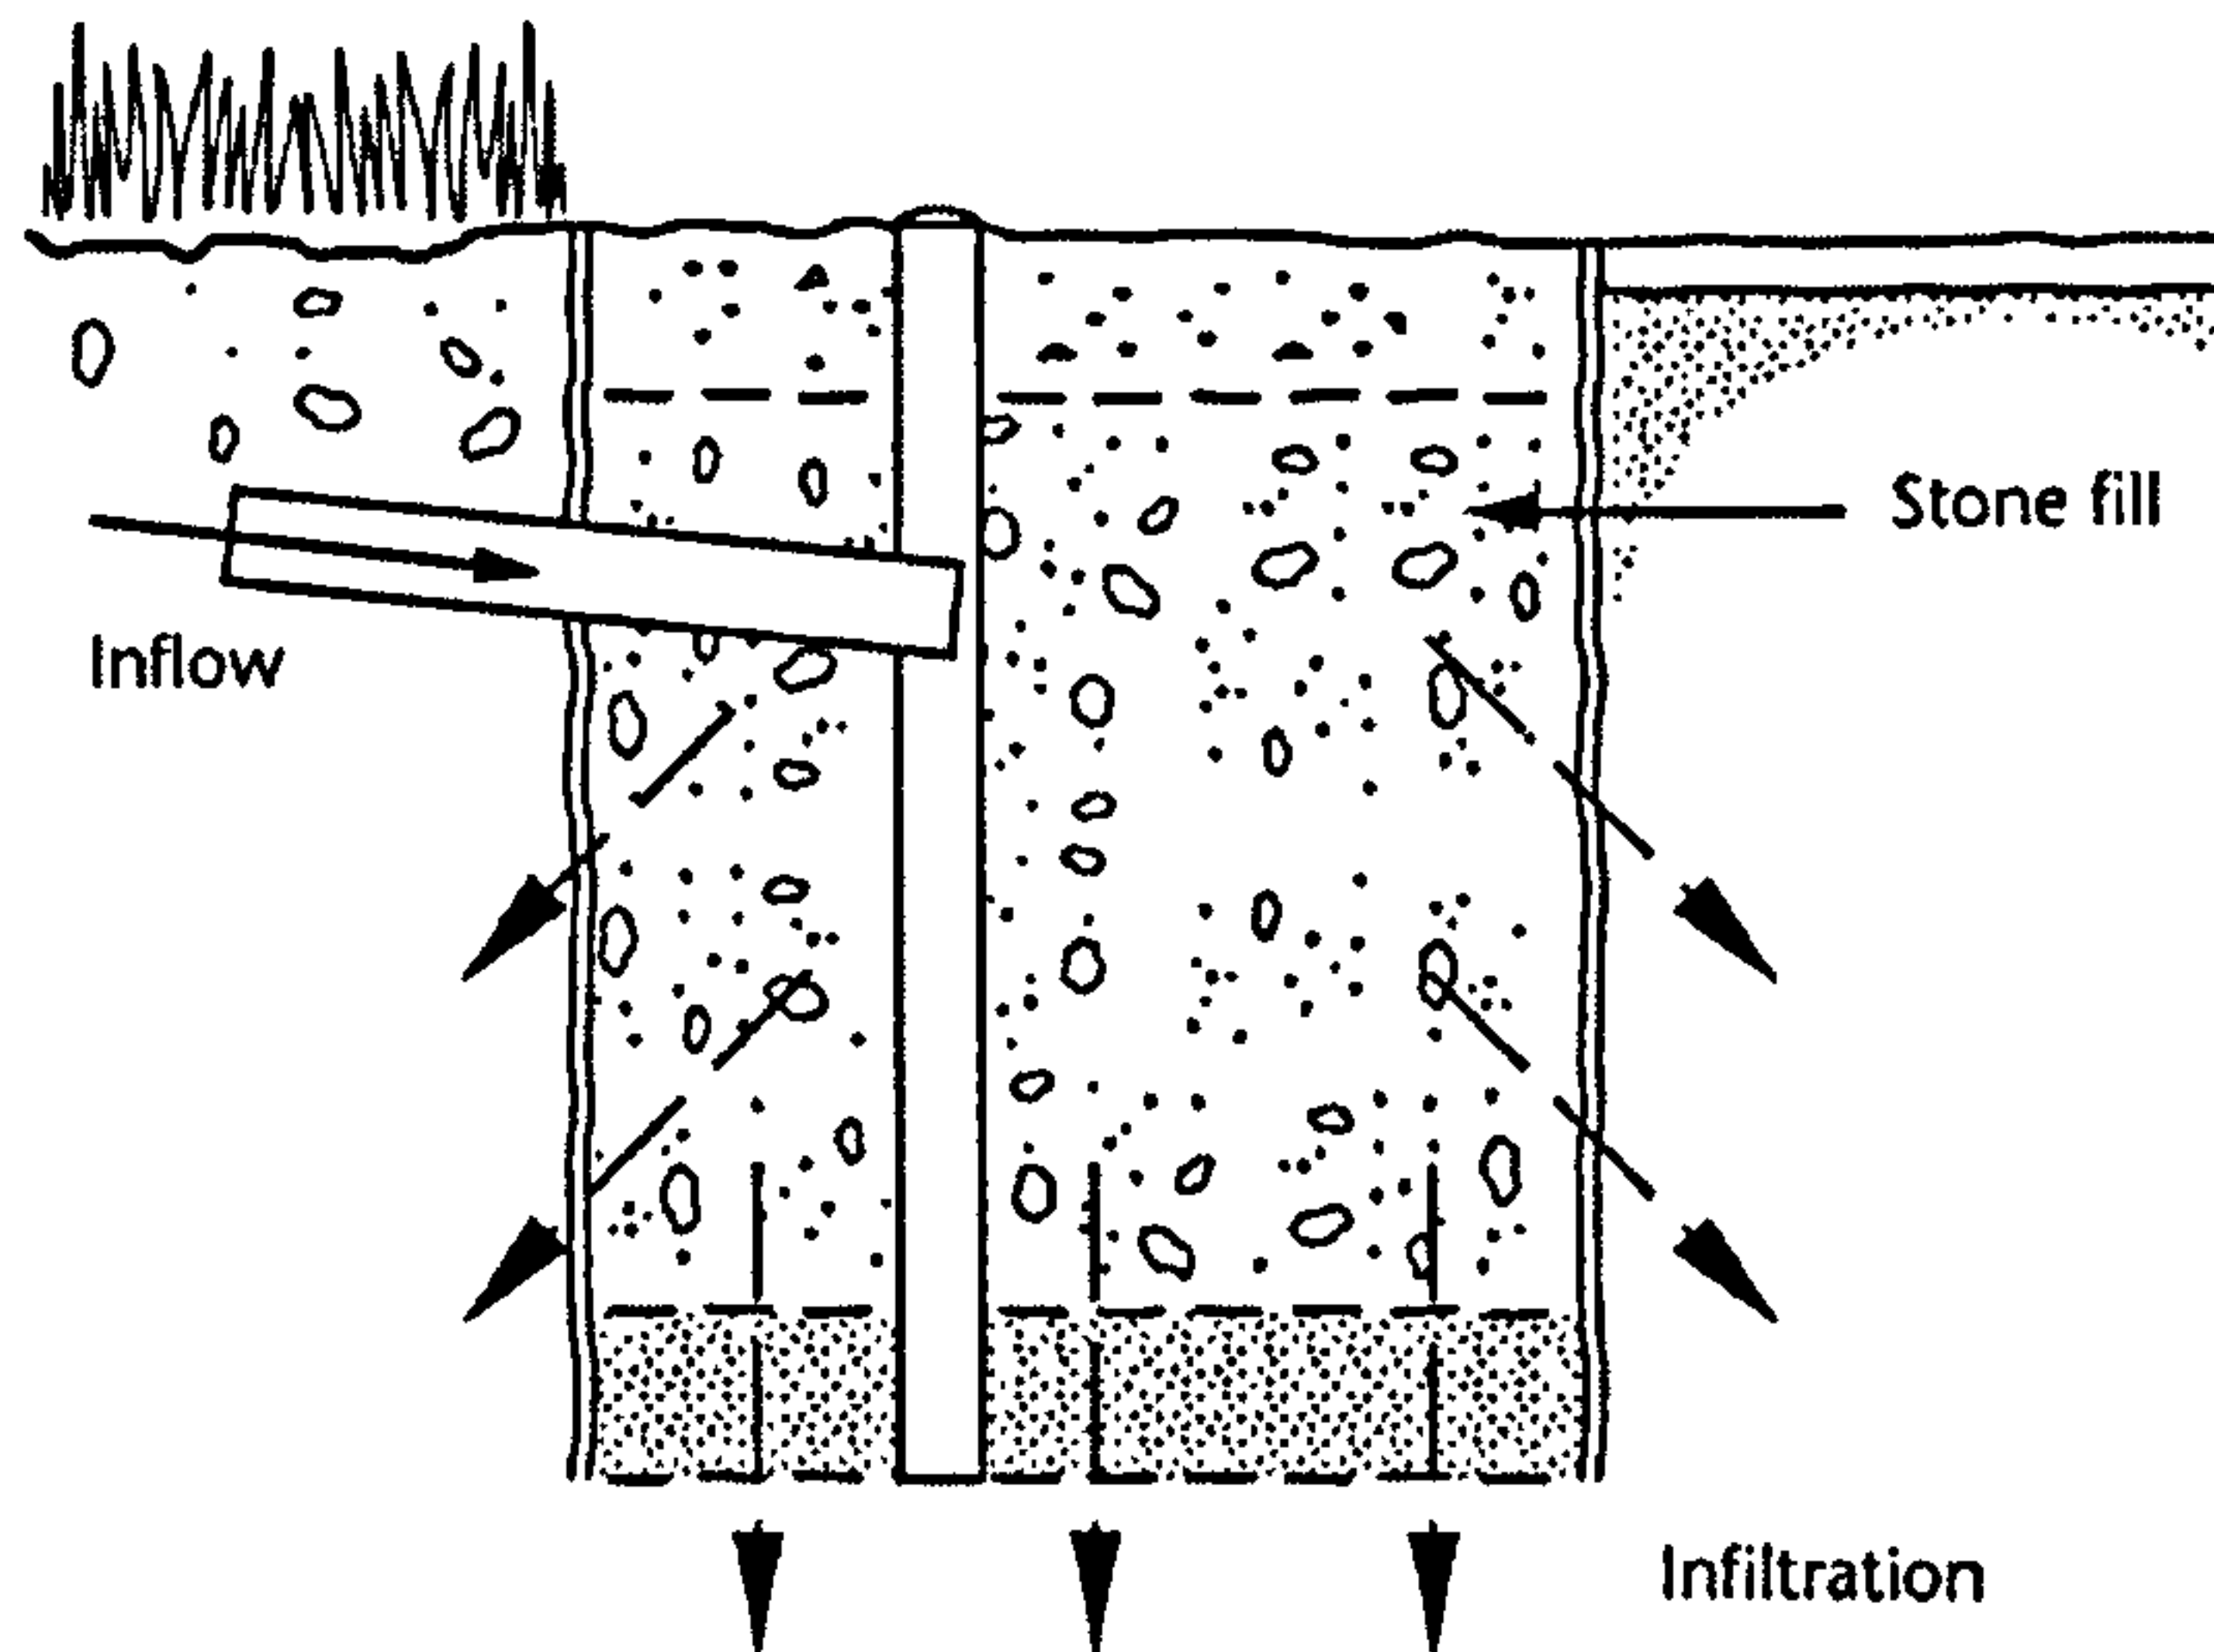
Cross section through an infiltration trench [EA, 2004].
